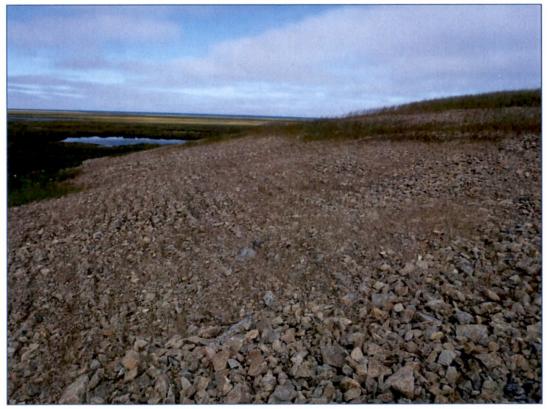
Site 7 Landfill – South slope of landfill, facing west.
